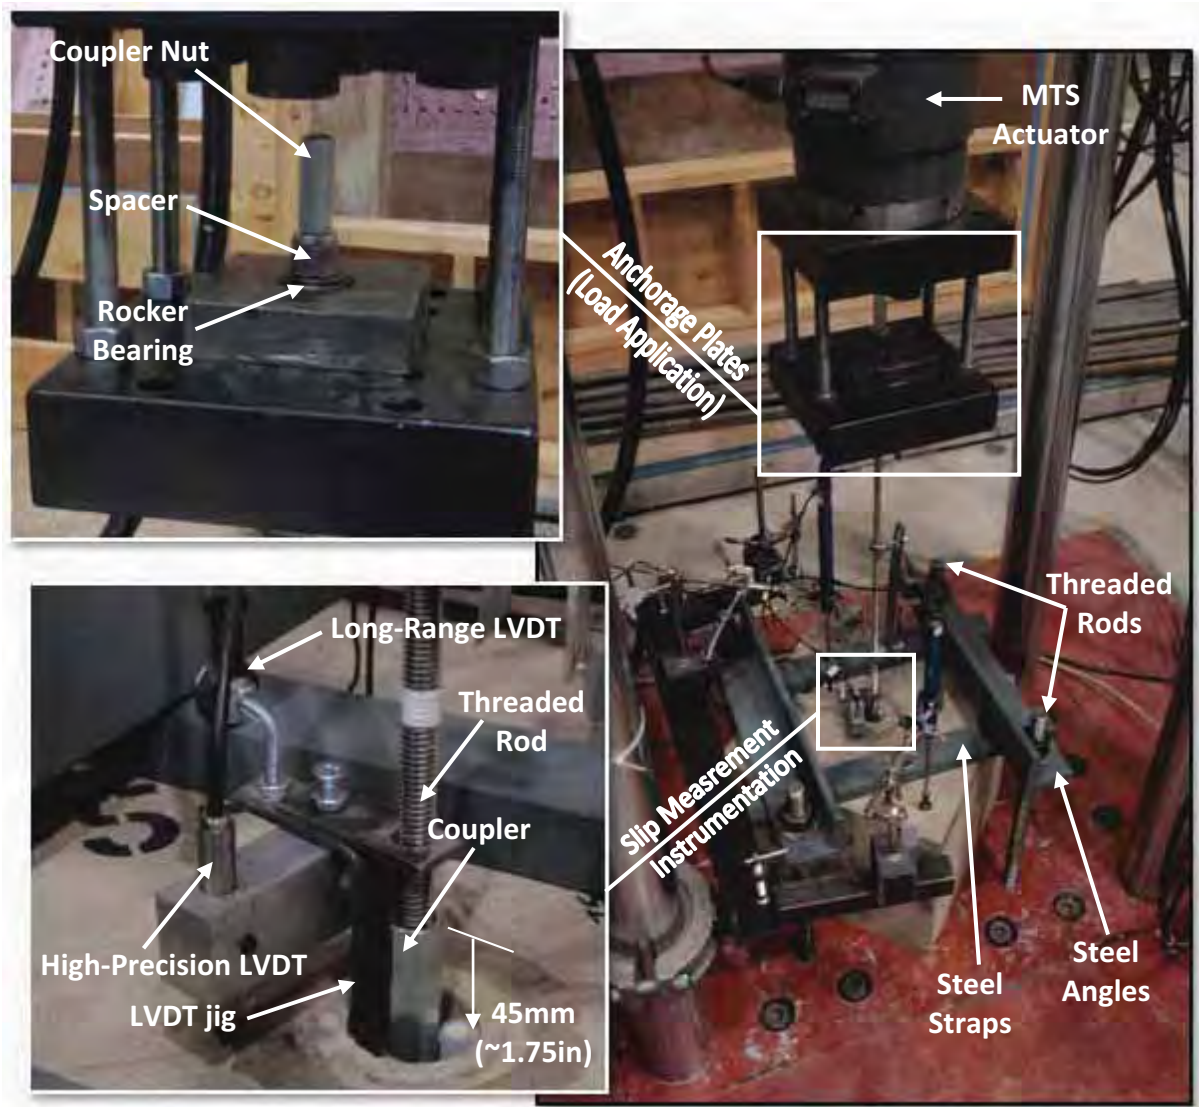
Pullout Test Setup: 1000kN MTS Machine
